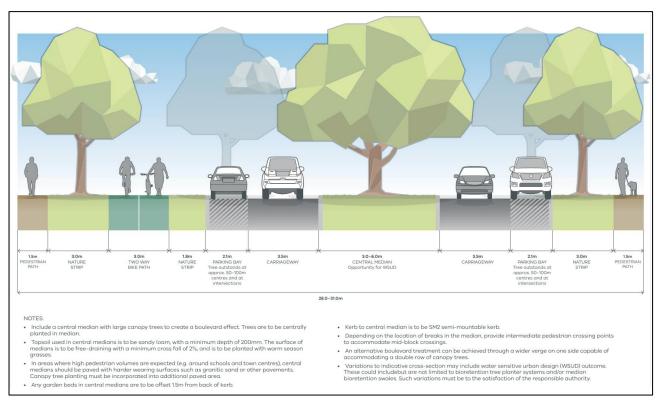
Connector street boulevard cross section – 28-31m (Source: VPA)
